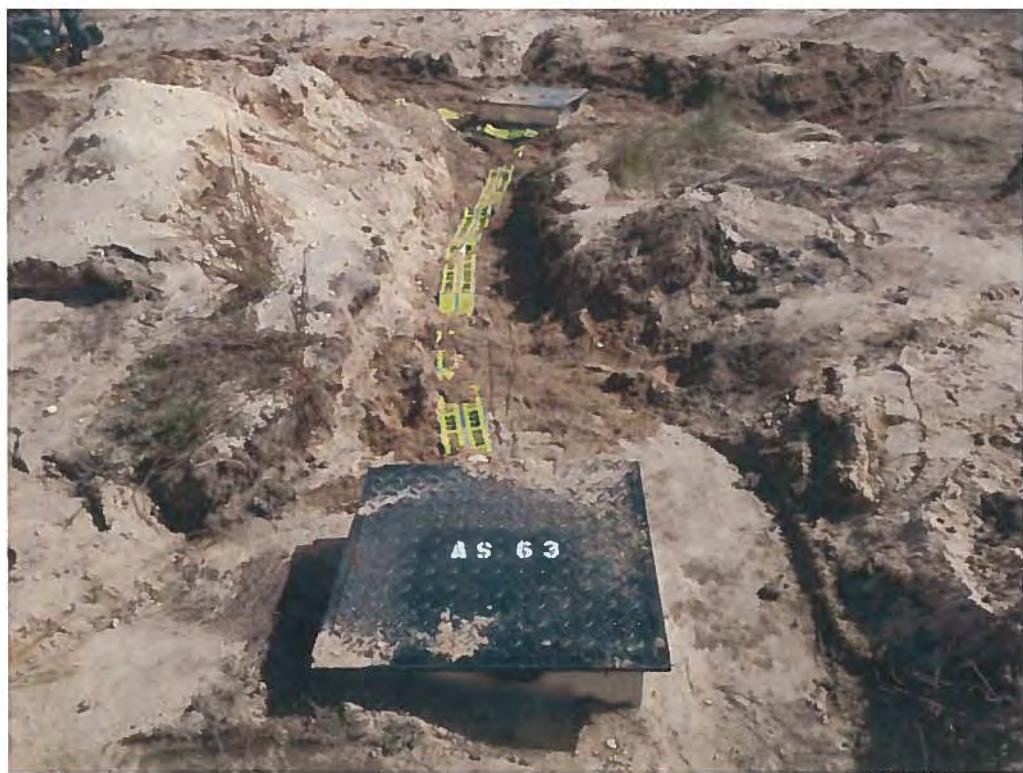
Installation of Sparge Vault with Utility Tape and Locater Wire
